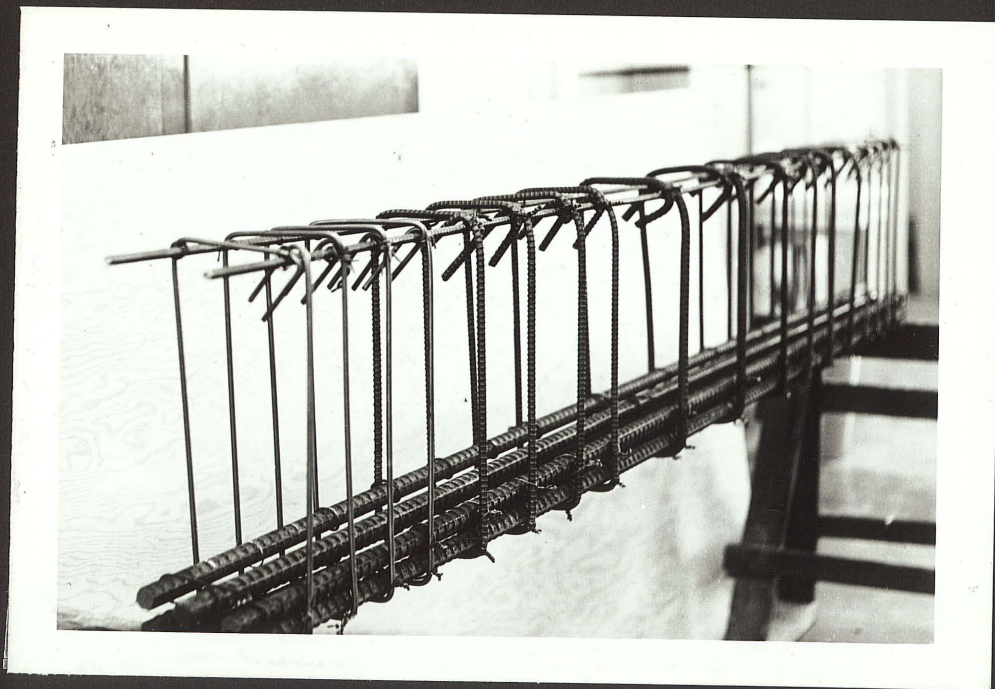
Side View of Reinforcement cage for Beam 4.
